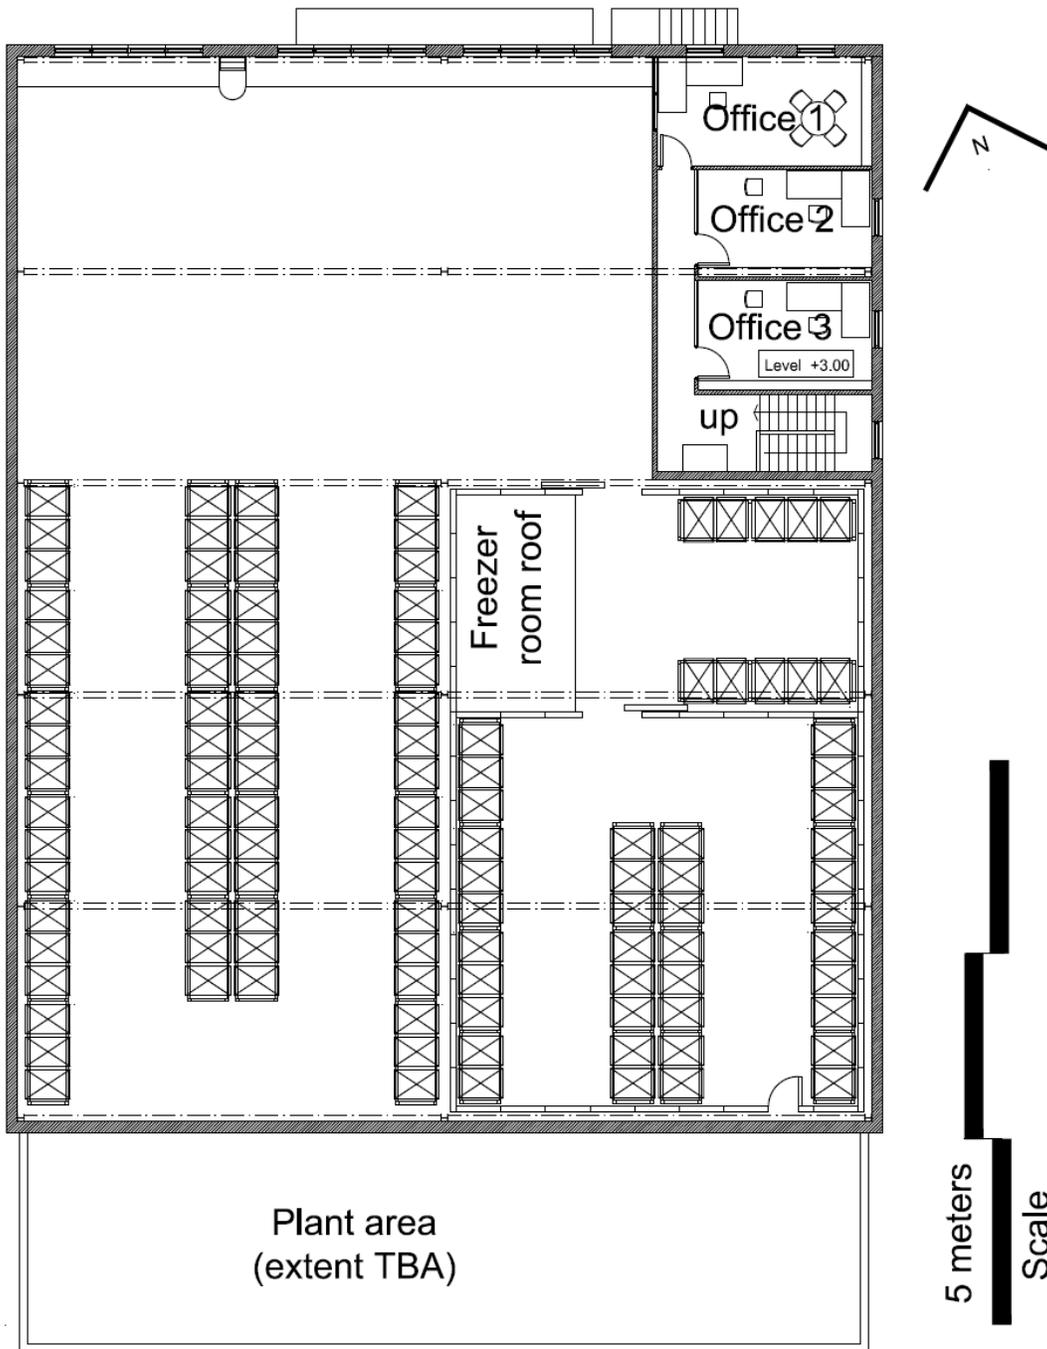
Final layout for the warehouse, first floor; adapted from (Garnett, 2013)
